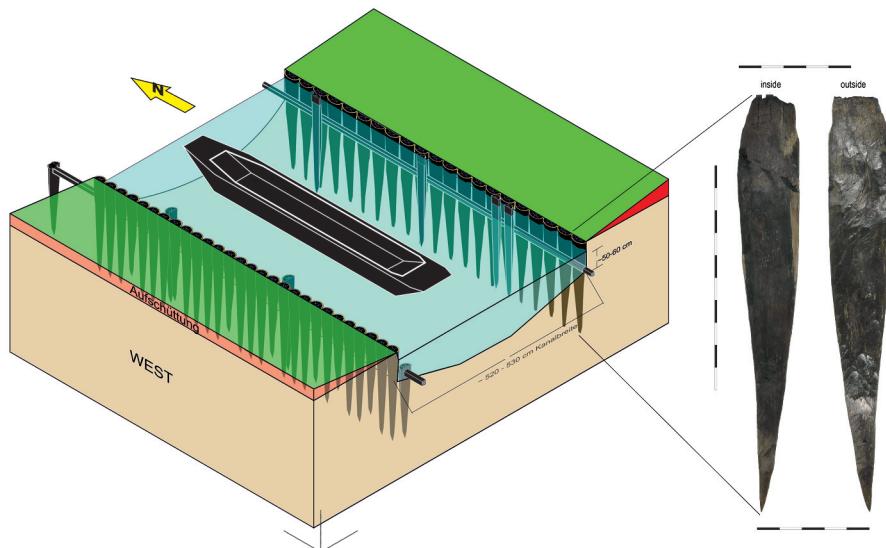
Reconstruction of the canal construction of the *Fossa Carolina* dated to 793 AD based on the excavation 2013 with an original oak pile of the bank reinforcement (drawing F. Herzig, L. Werther).
